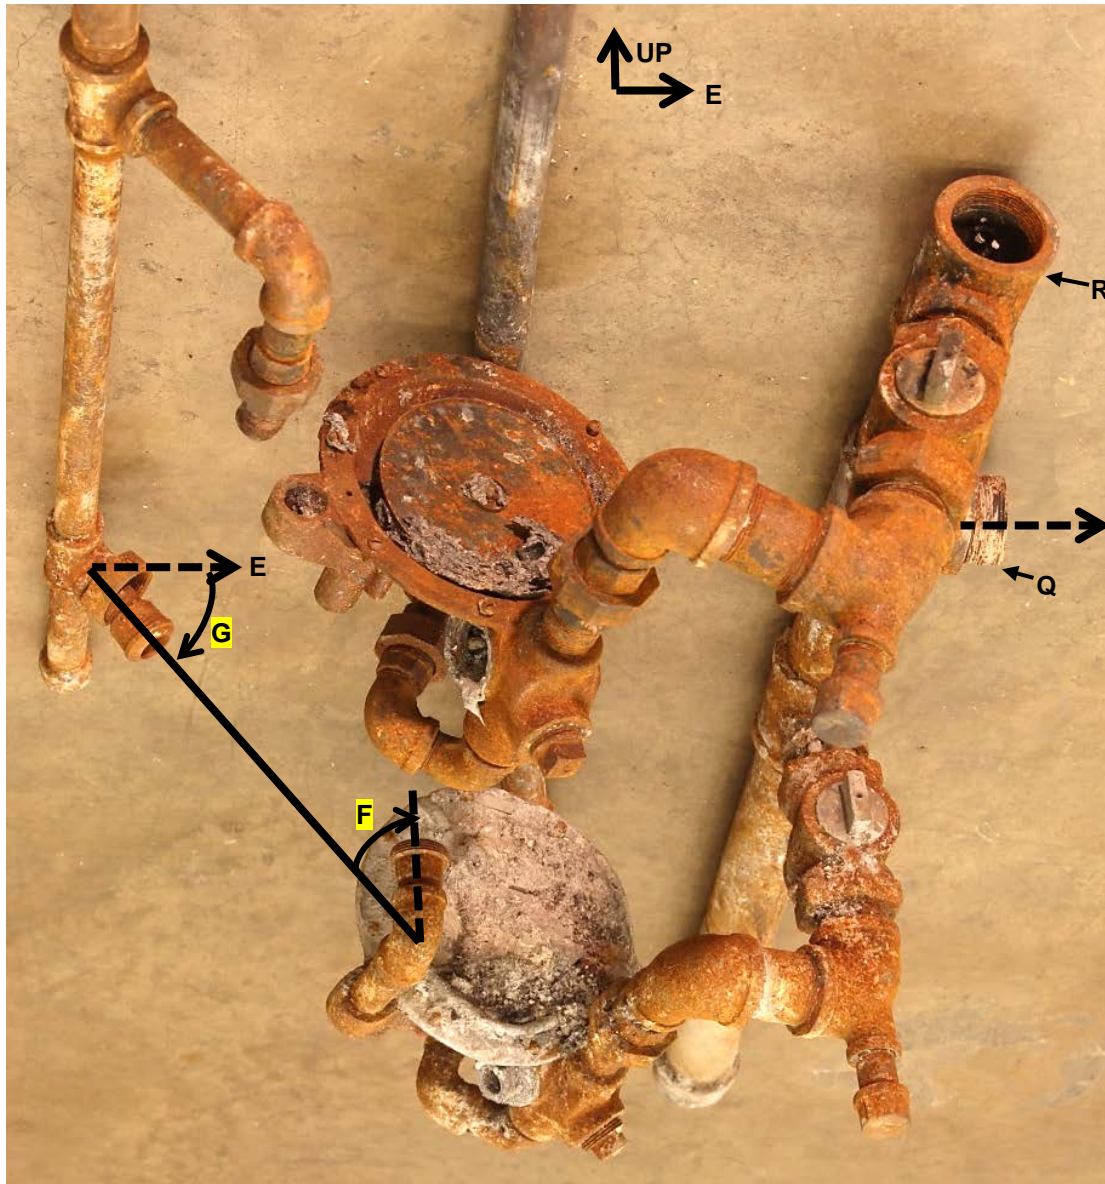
View looking down at the upper and lower pressure regulator assembly. East is indicated by "E".
